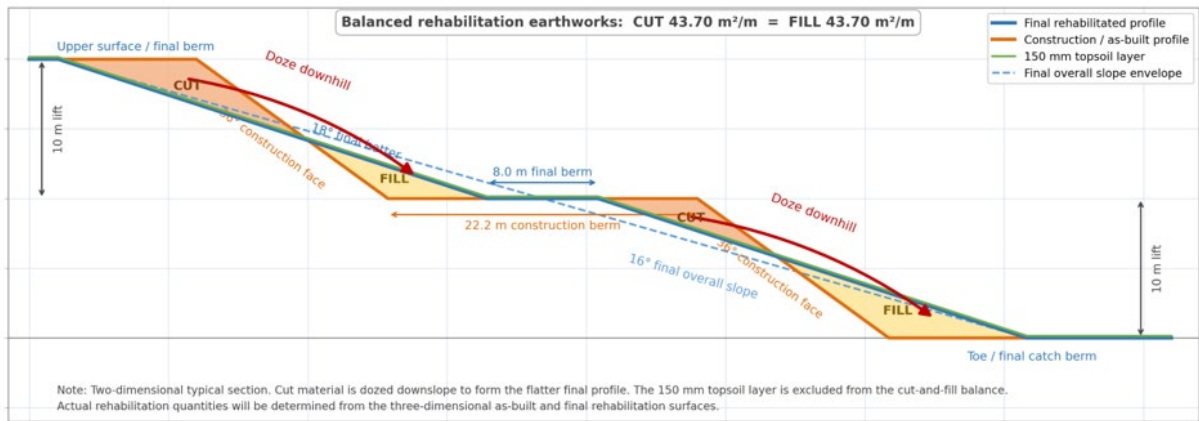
Waste Rock Dump Typical Construction and Rehabilitated Profile
